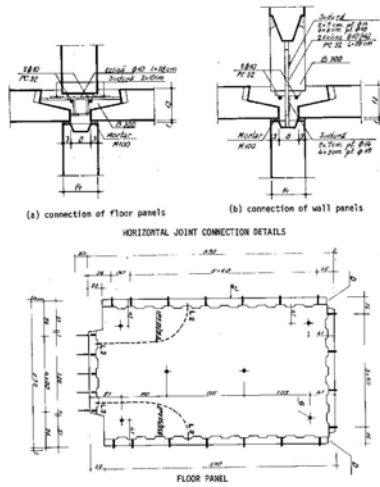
Floor panel and horizontal joint details (NBS 1977)
